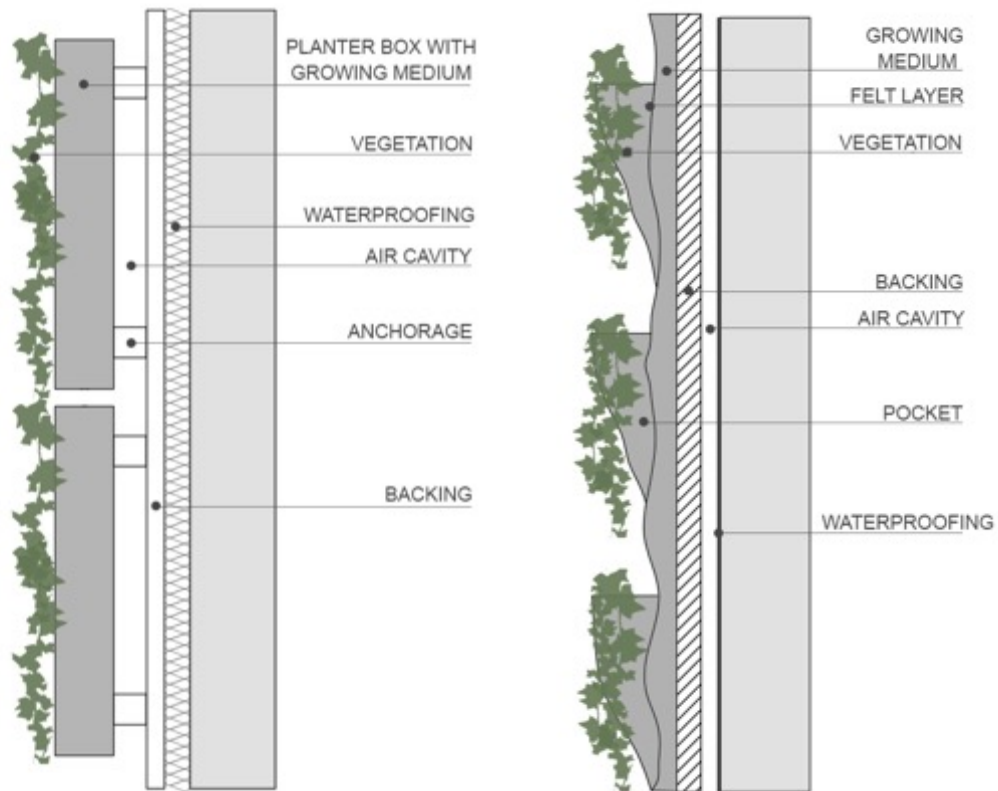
(a) Living wall system based on planter boxes; (b) Living wall system made with felt layers.
